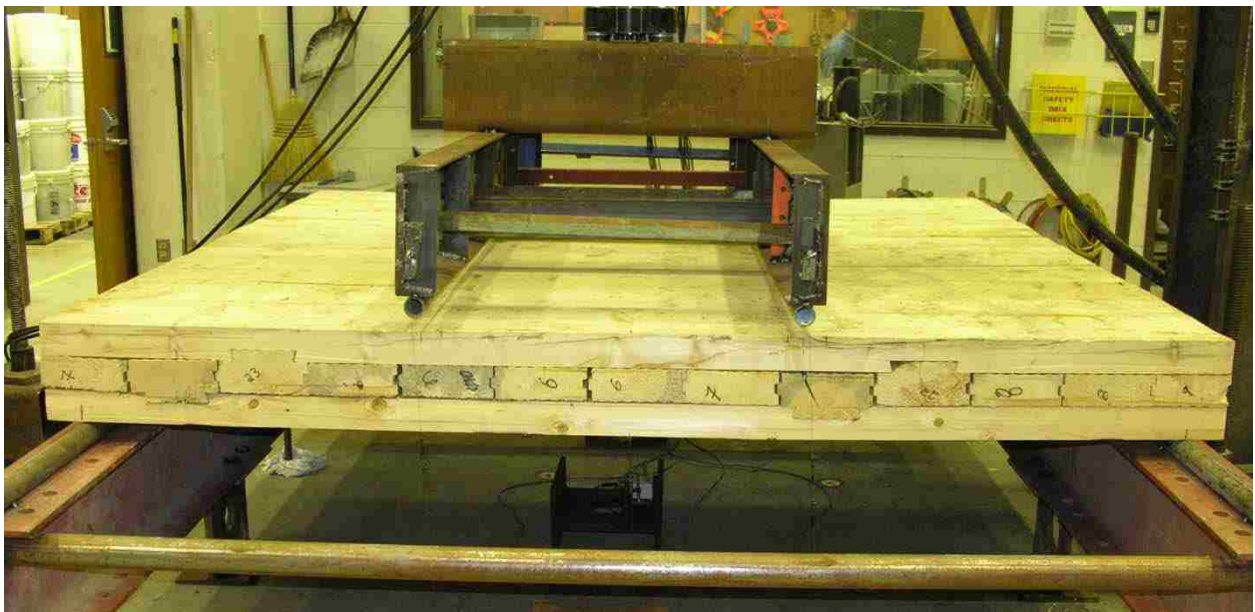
Rebound of Flexural Wall after Failure on the North Side
